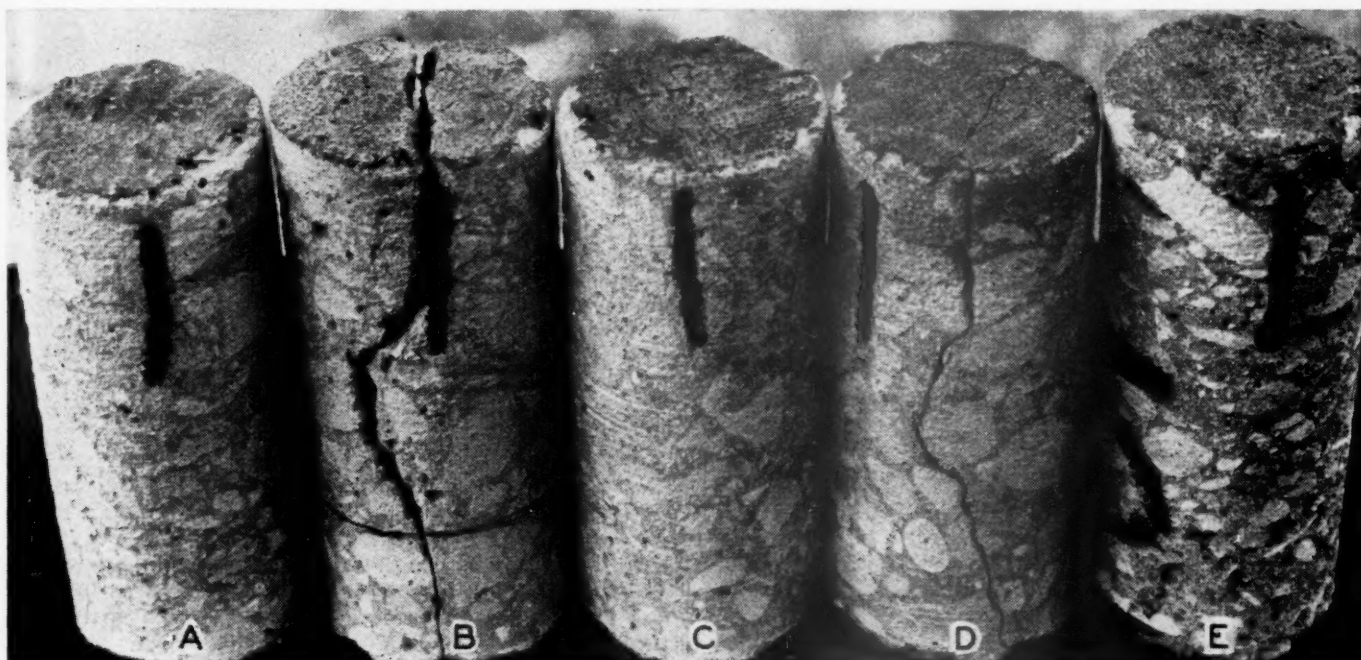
TYPICAL CORES DRILLED AT THE LONGITUDINAL JOINT IN THE 1942 ILLINOIS PAVEMENTS.
